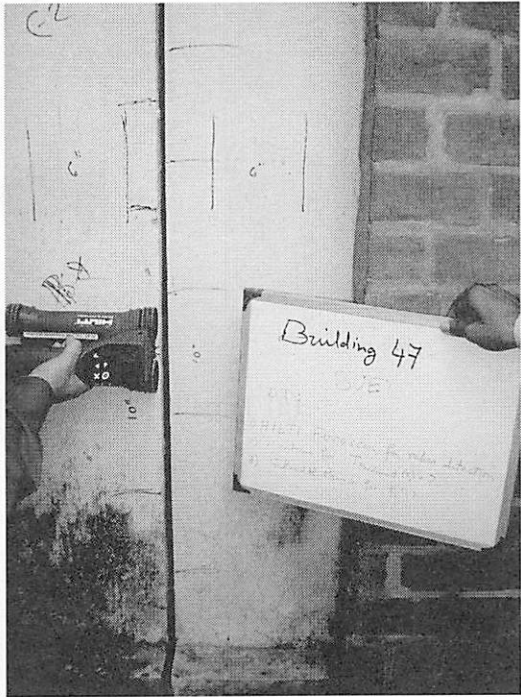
(b) Reinforcement detection and marking in column at the ground floor of Building 47
